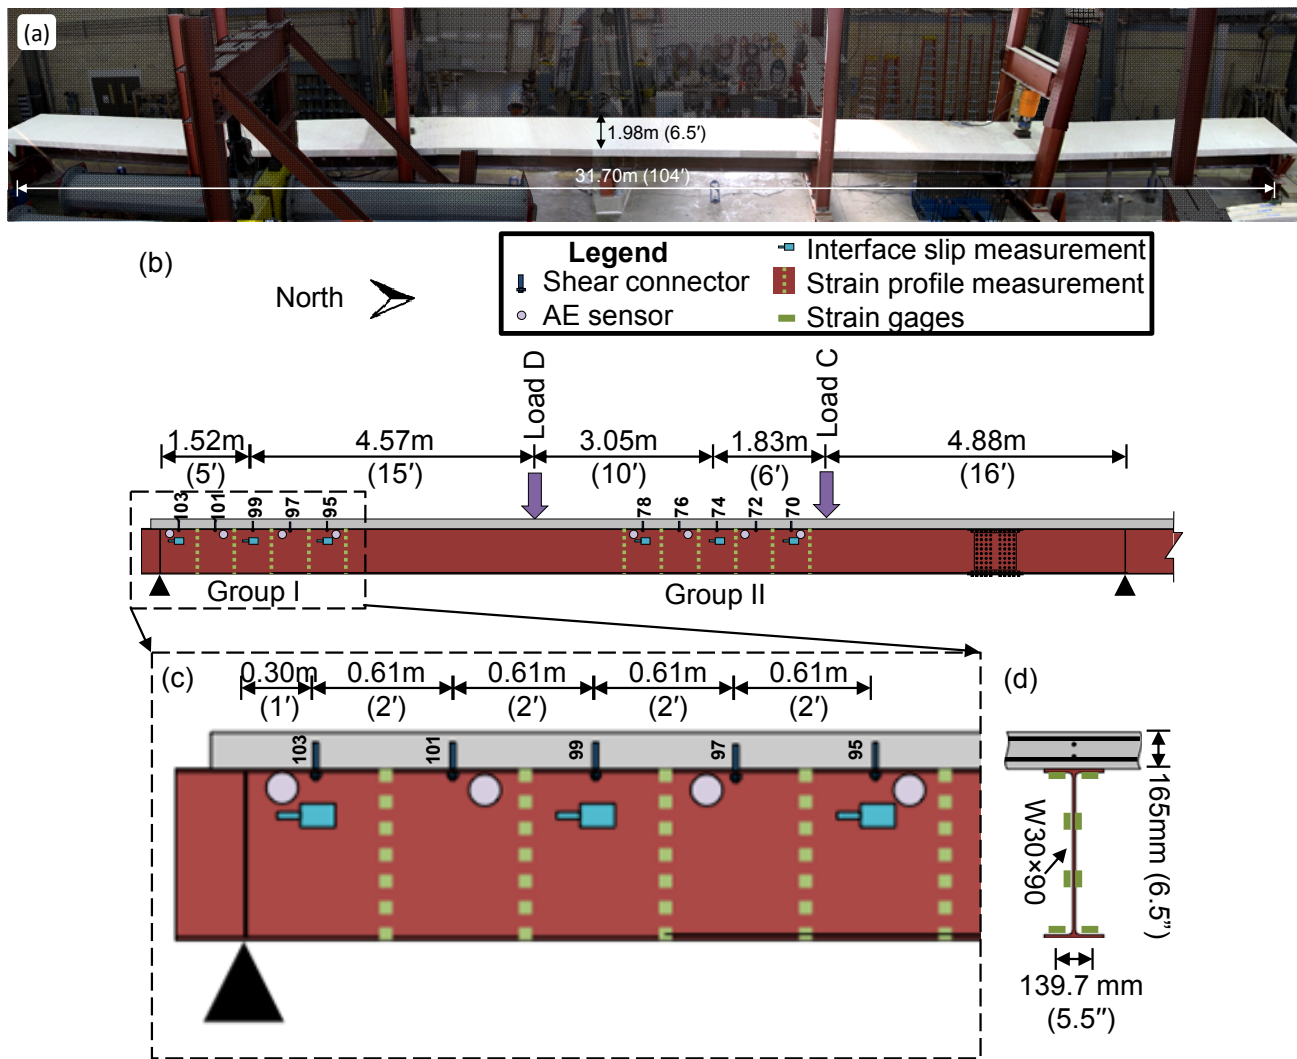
Experimental setup: (a) test specimen, (b) schematic view of the instrumented specimen, (c) magnified view of the instrumentation, and (d) cross-section of the specimen.
